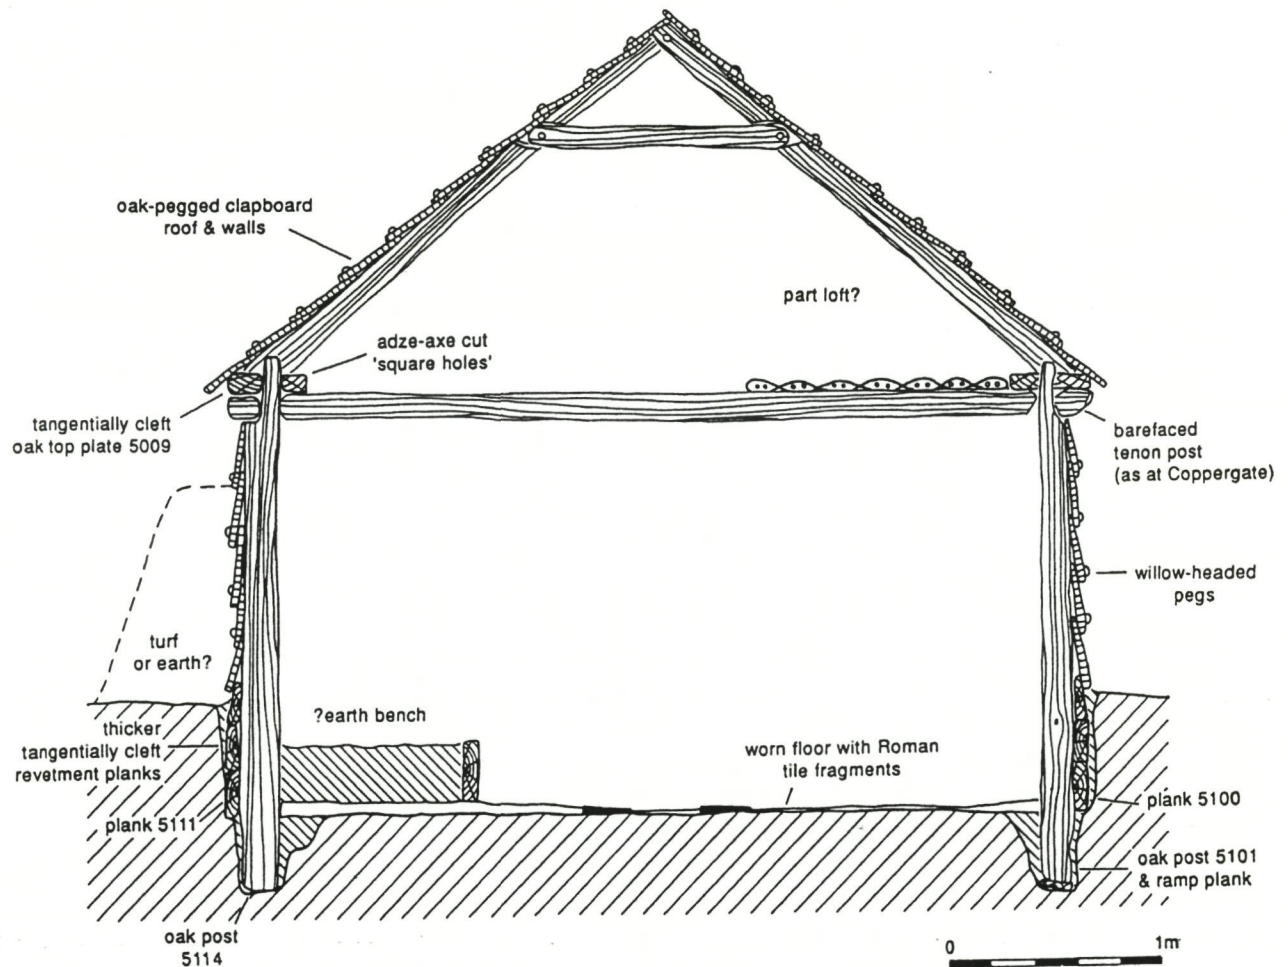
A hypothetical reconstructed cross section of a mid 10th century sunken floored building from site CID90. Several of the timbers shown were found in situ, and some collapsed. All the details of the woodwork are within the archaeologically documented repertoire of London's treewrights. Some details of the junction of the wall and roof are taken from evidence at Coppergate, York.
